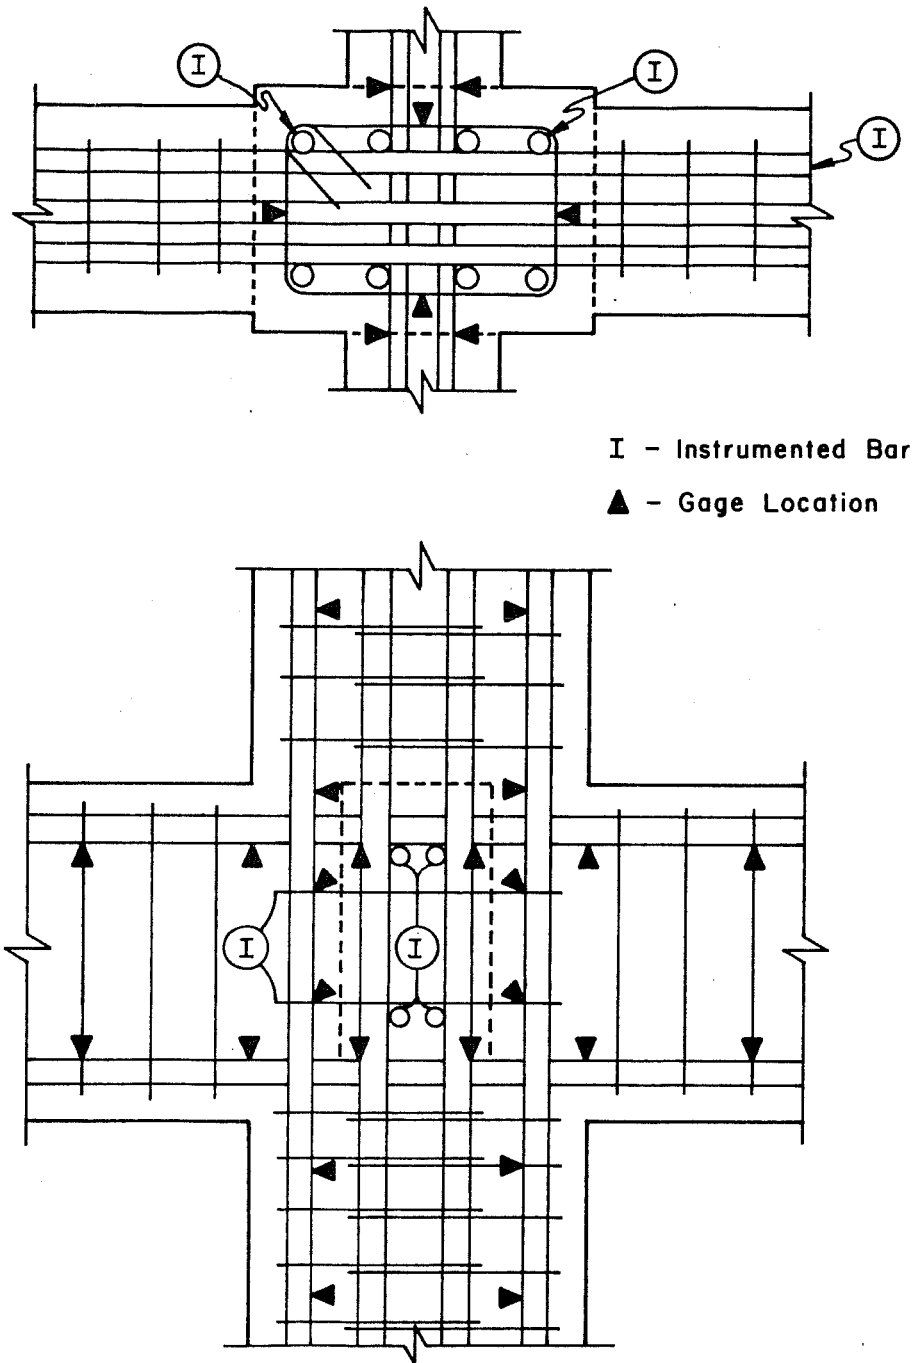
Locations of electrical resistance strain gages on a typical specimen
